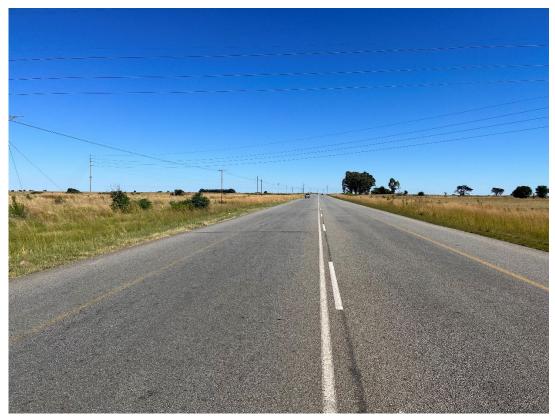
Existing Road P28-4 @ Km 7.15 – West Approaching (Access 1)
